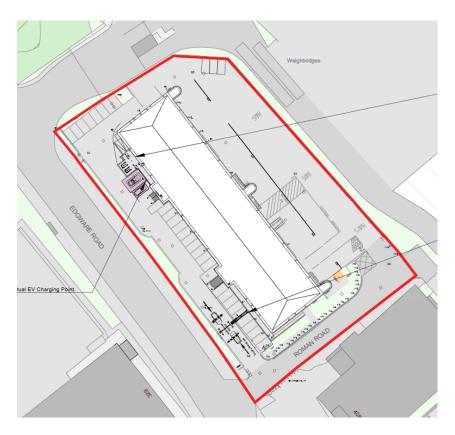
Existing Parking on Site, as shown in 23/4793/FUL and associated condition submissions
